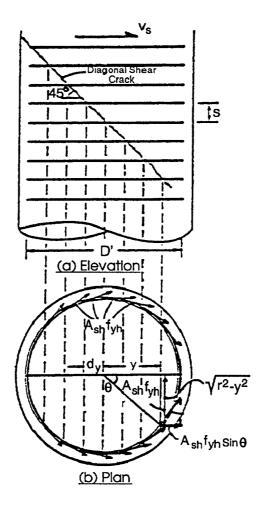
Truss mechanisms for circular columns (from ref. 18).
